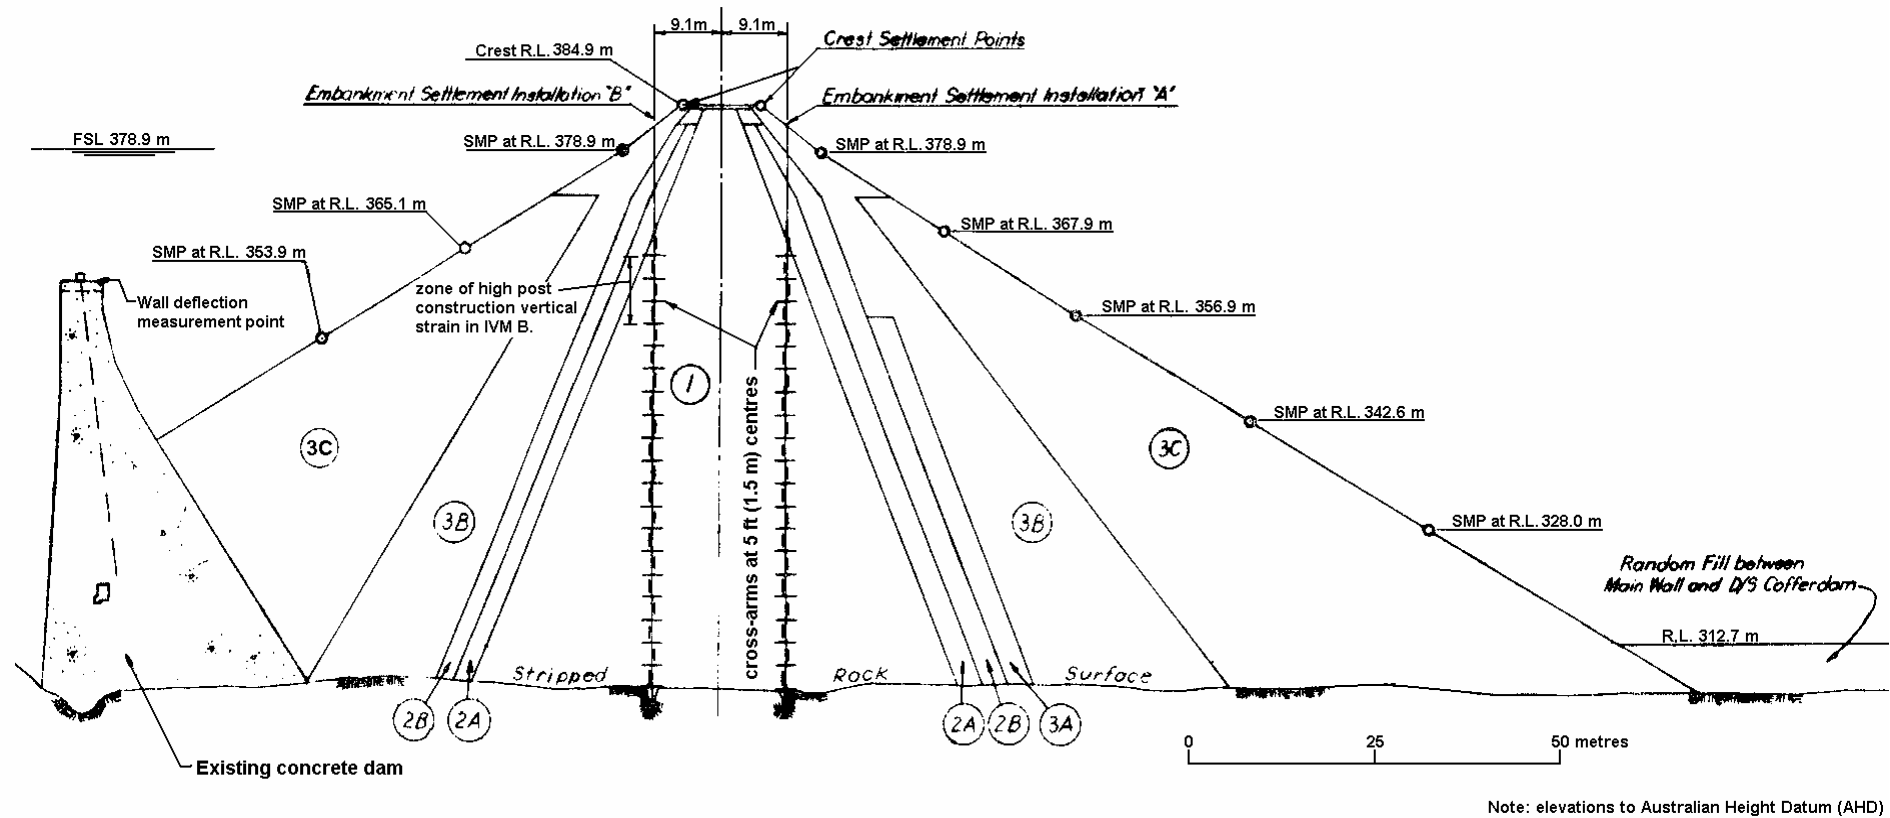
Wyangala dam; SMP and IVM locations at main section (courtesy of New South Wales Department of Land and Water Conservation).
